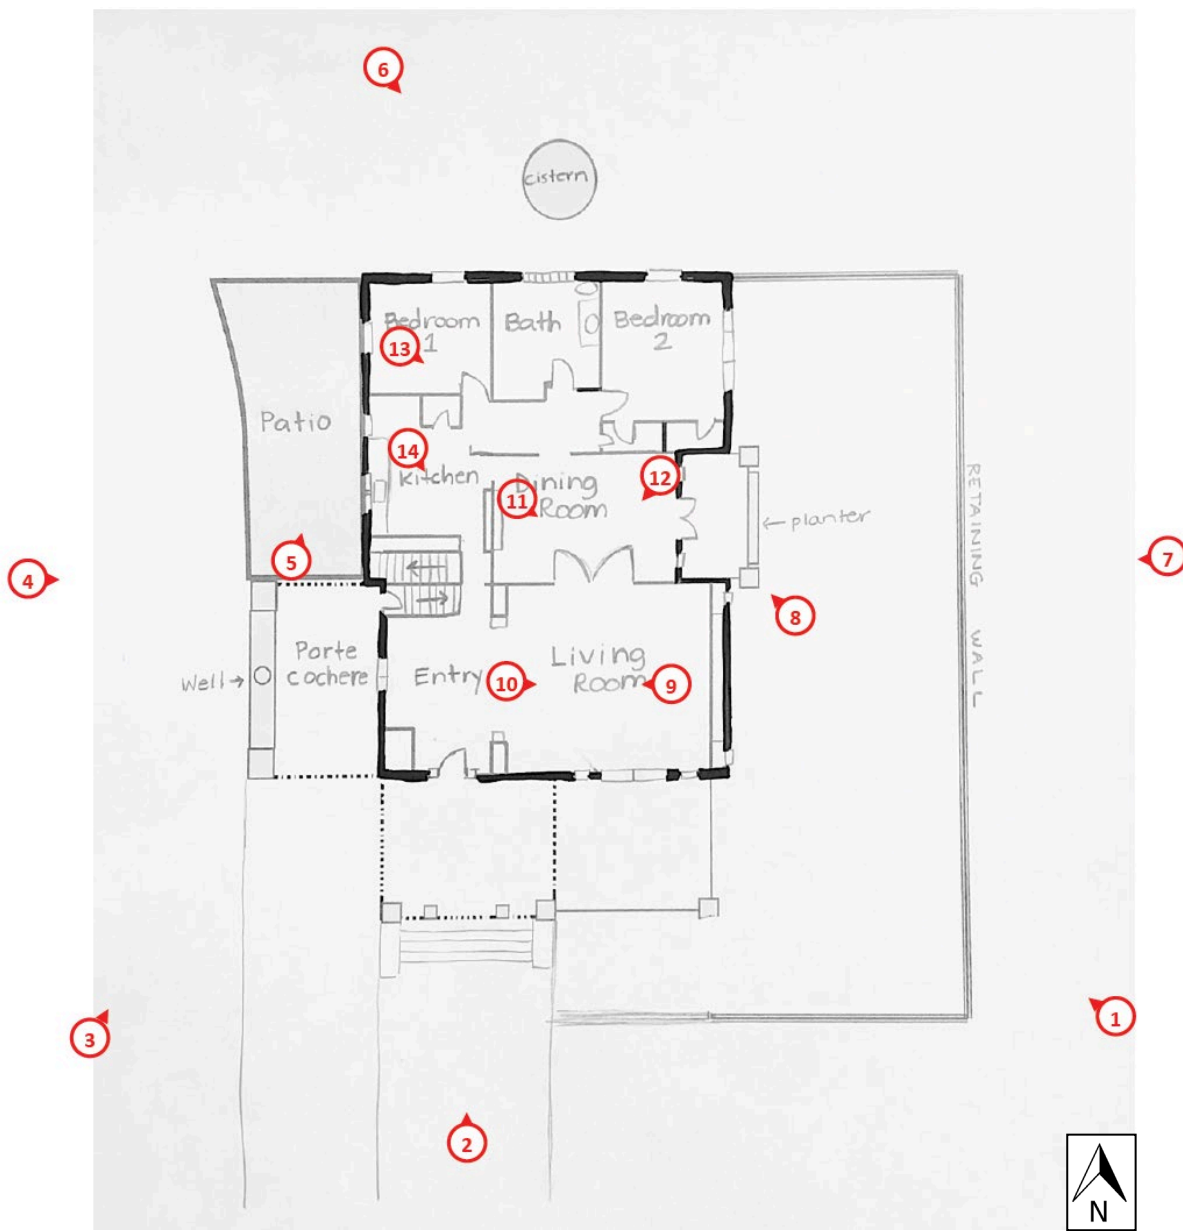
Floor plan and key to photographs, 1st floor (plans not to scale)
